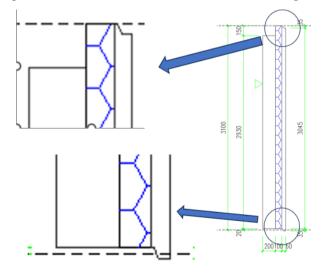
YJK' s built-in prefabricated building design software automatically sets up tongue-and-groove joints for prefabricated external walls.
